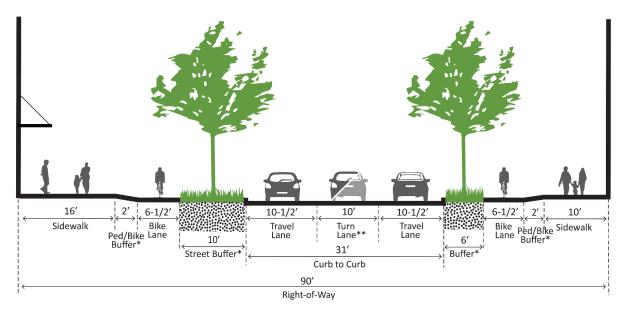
East-West Highway (M-20): 16th Street to Blair Mill Road, Looking North
